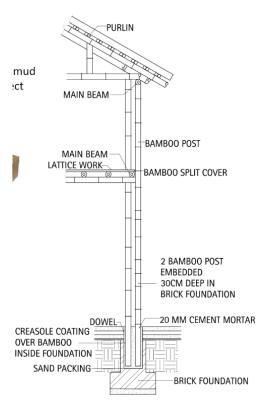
BAMBOO POST AND ROOF DETAILS
